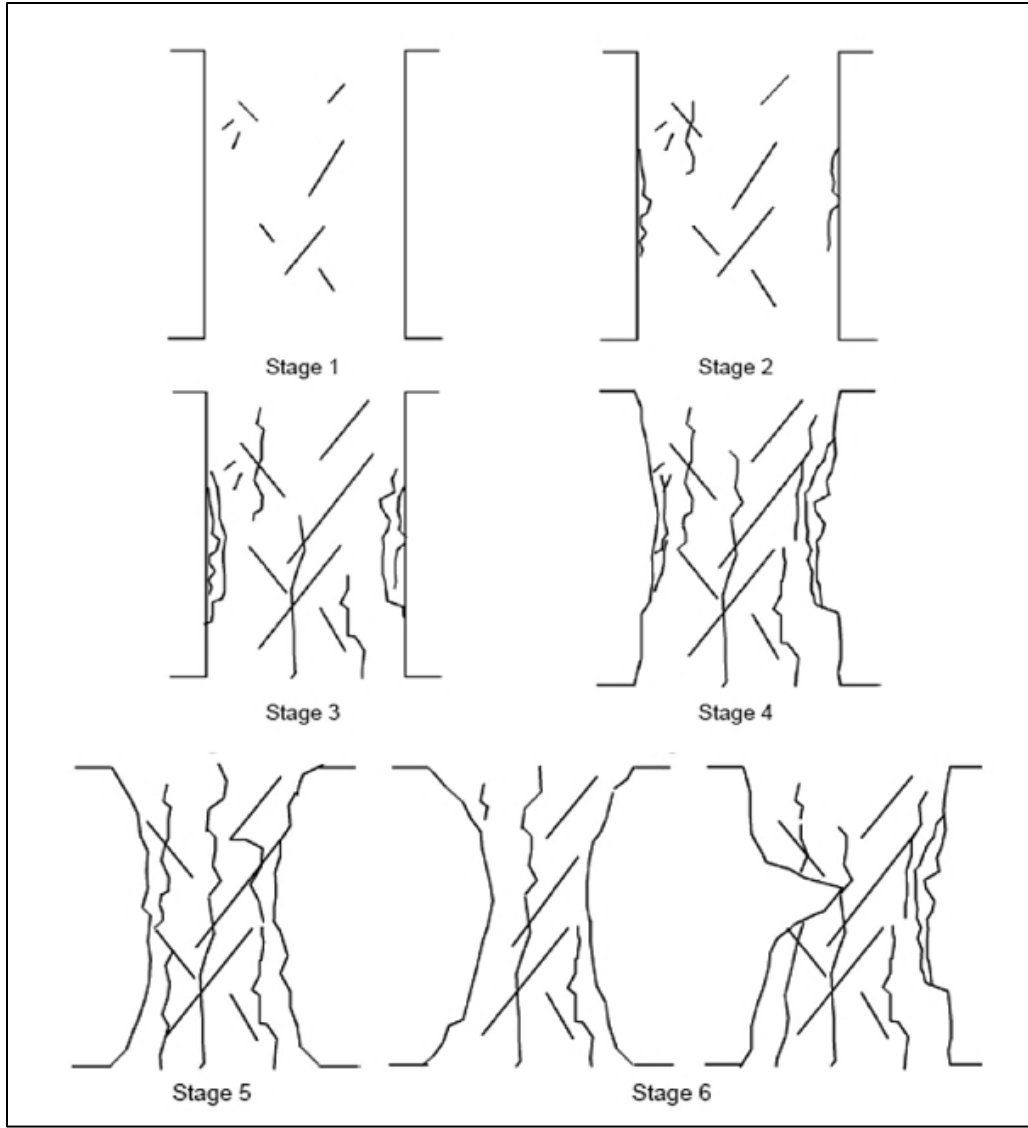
Pillar failure rating system; Stage 1: Intact pillar; Stage 2: Minor spalling; Stage 3: Substantial spalling; Stage 4: Formation of hourglass shape; Stage 5: Well-developed hourglass shape; Stage 6: Failed pillar - Two different ways by Roberts [120].
